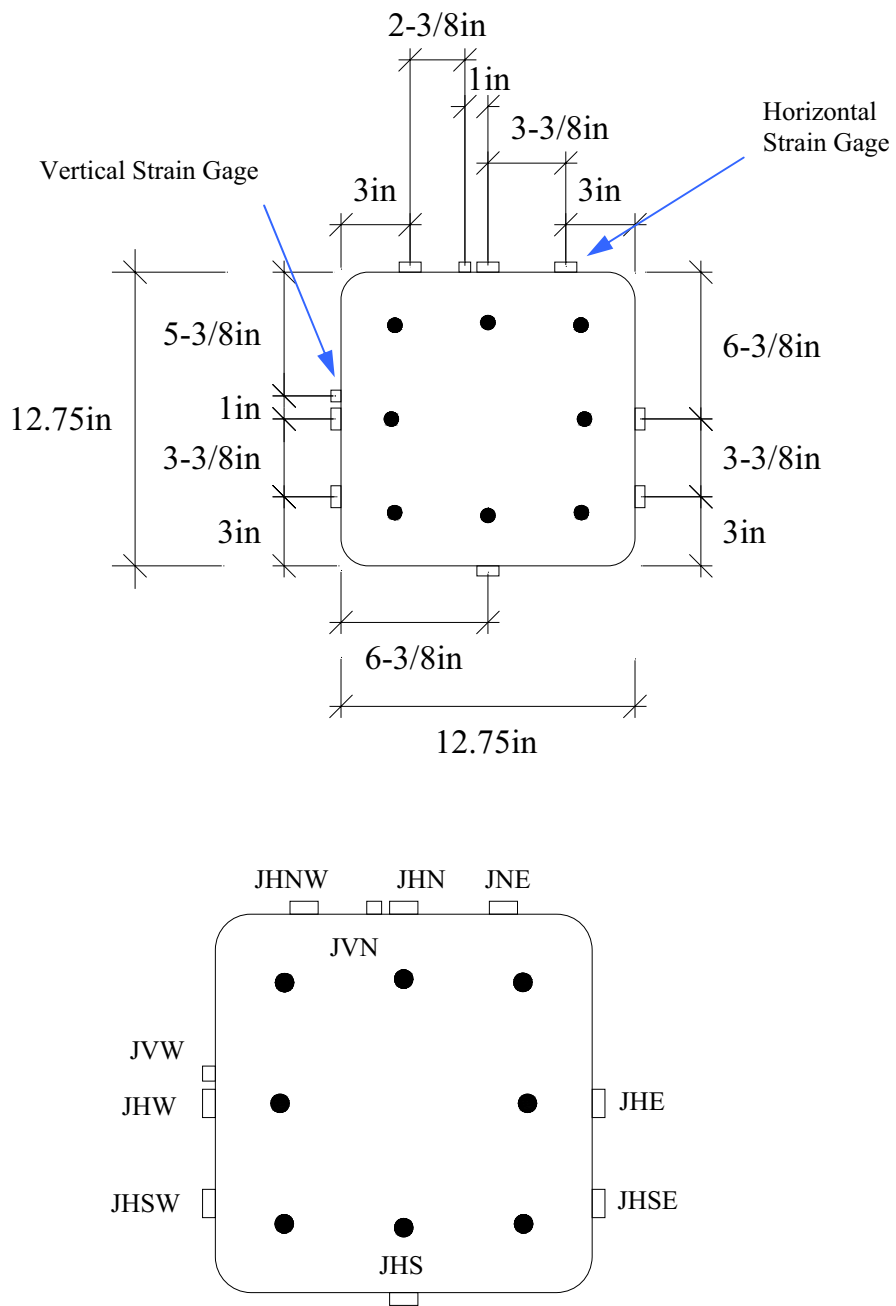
Section B-B; Strain Gages Location on FRP; Specimens E2 & E3
